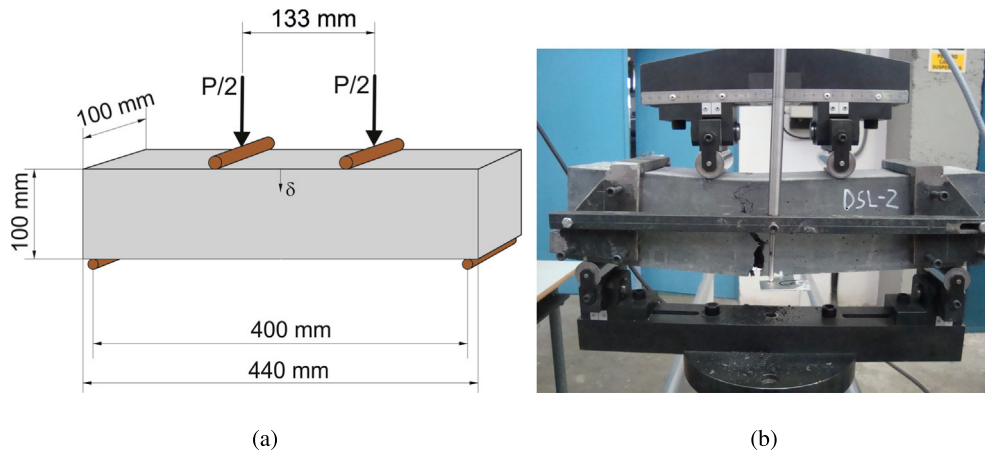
Four-point bending test: a) drawing of the test with dimensions and b) photograph of one of the unnotched specimens during the test.
